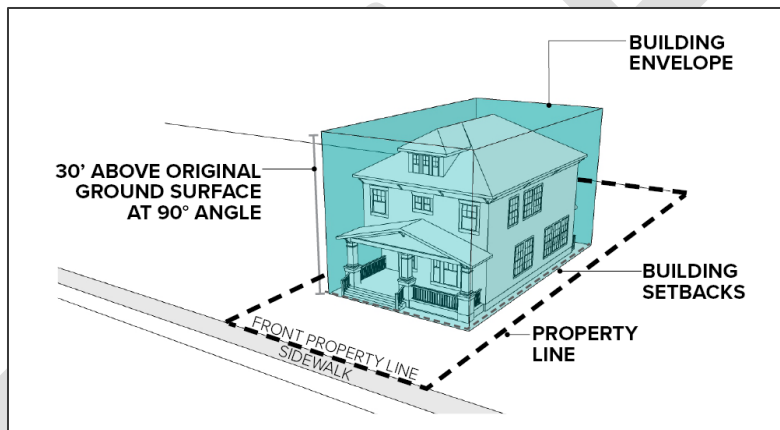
XX.4 R-1-6 Building Envelope (alternative – apply to R-3,4 and 5)
